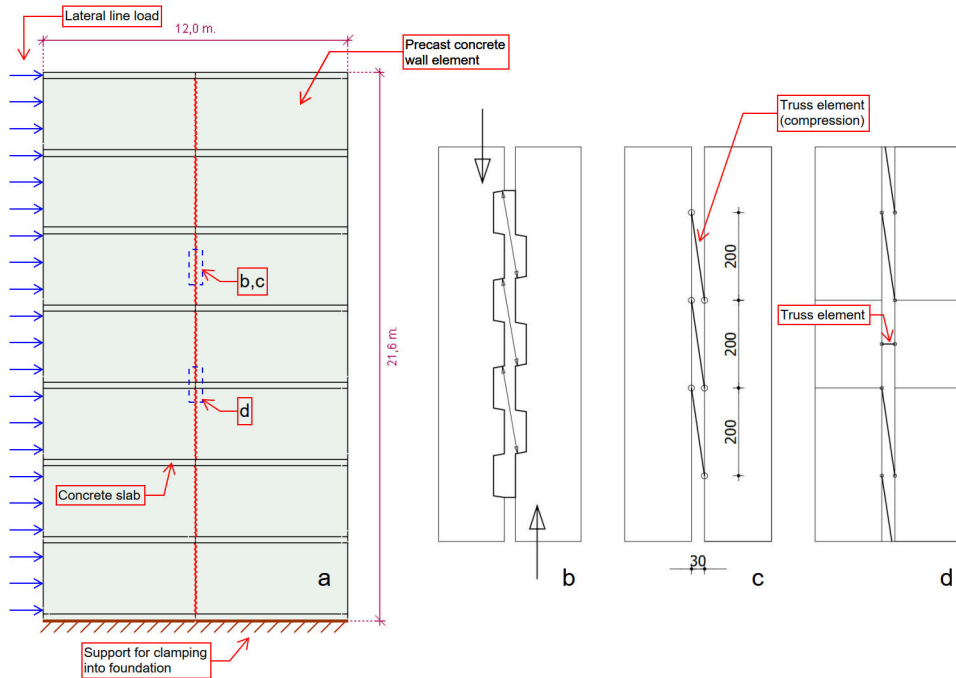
Precast concrete cantilever shear wall (a) with Staggered shear key connections (b), modeled inclined truss elements (c) and truss elements to represent the slabs (d).
